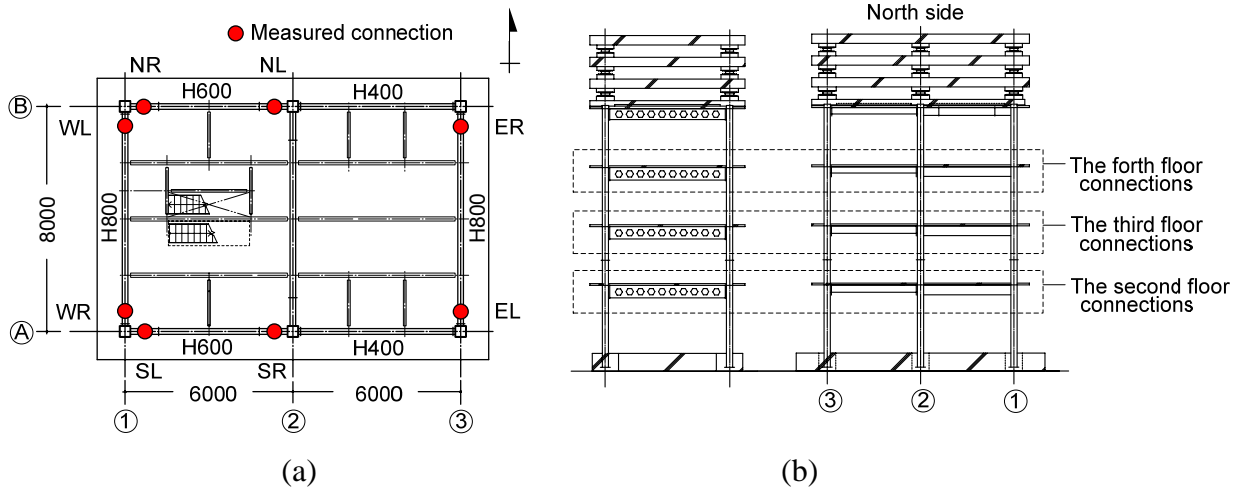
Measurement of connections: (a) Typical specimen plan; (b) Elevation
